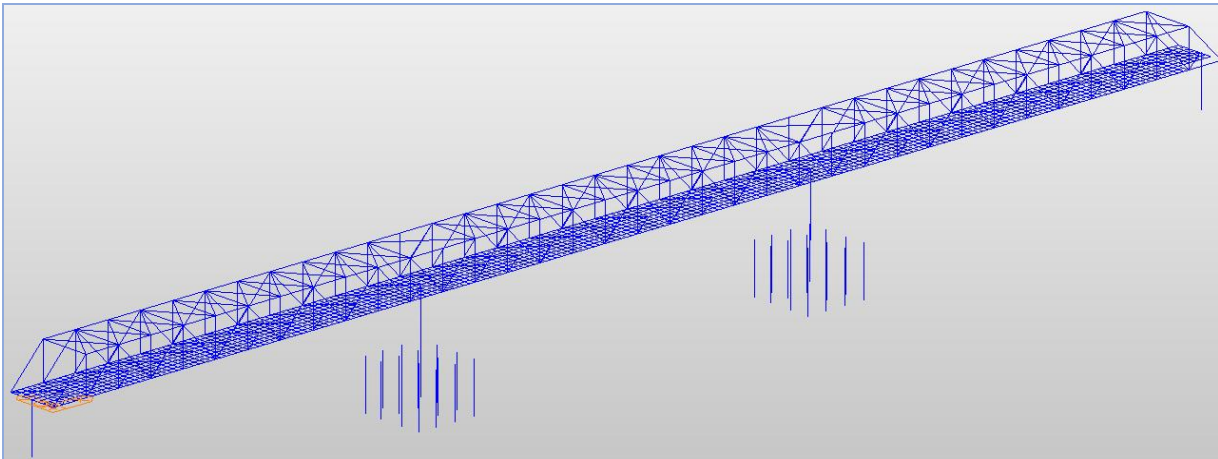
MIDAS – Truss Bridge - Nodal Representation
